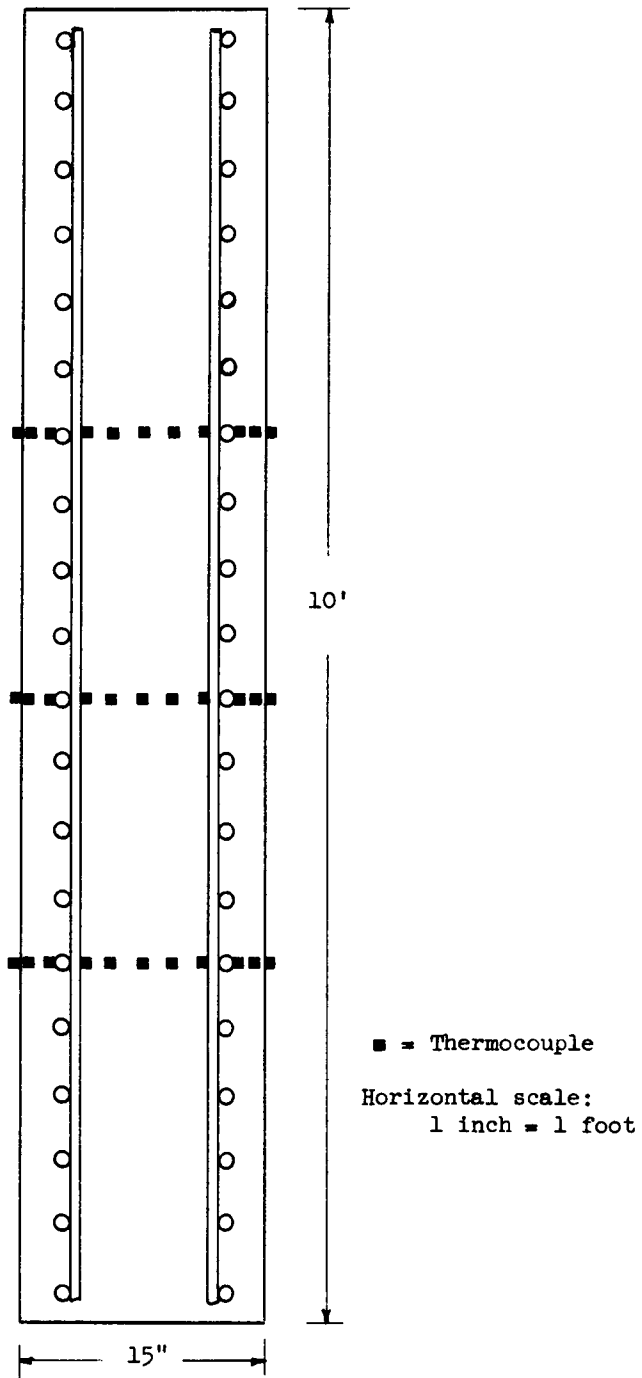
Instrumentation and Reinforcement in Concrete Test Panel.
